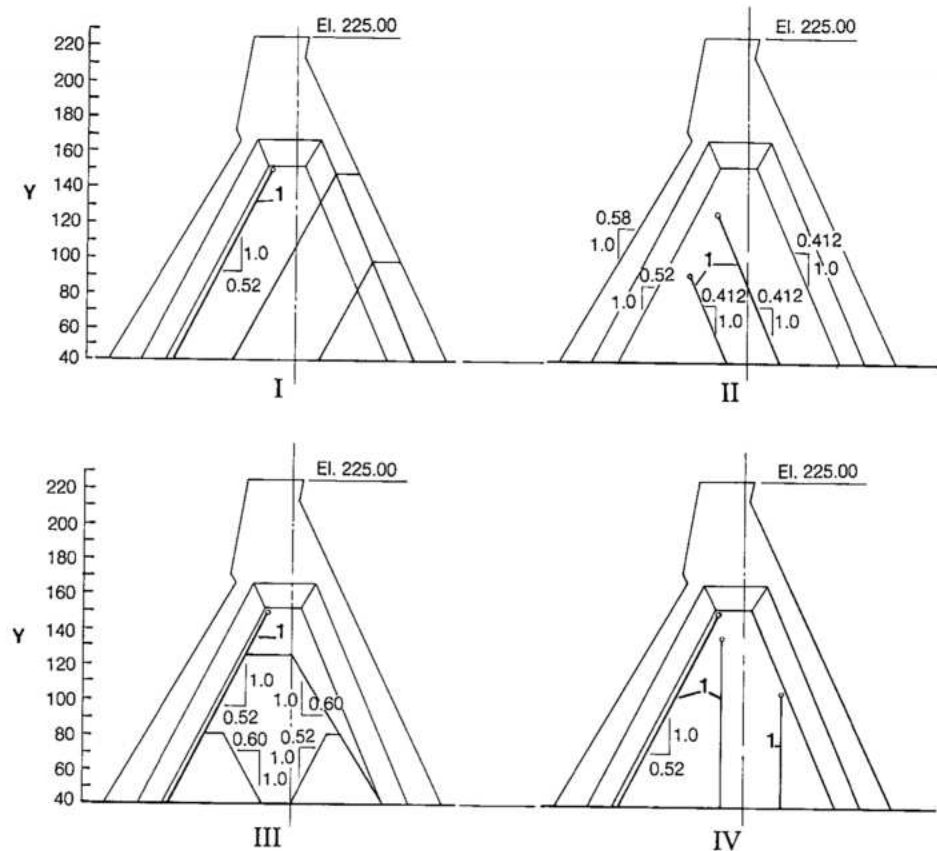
Hollow gravity dam longitudinal contraction joints arrangement alternatives
